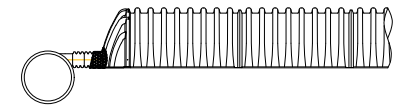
HEADER WITH REDUCING STUB AT CROWN INTO INVERT OF END CAP WITH HEADER INVERT BELOW CHAMBER INVERT.
